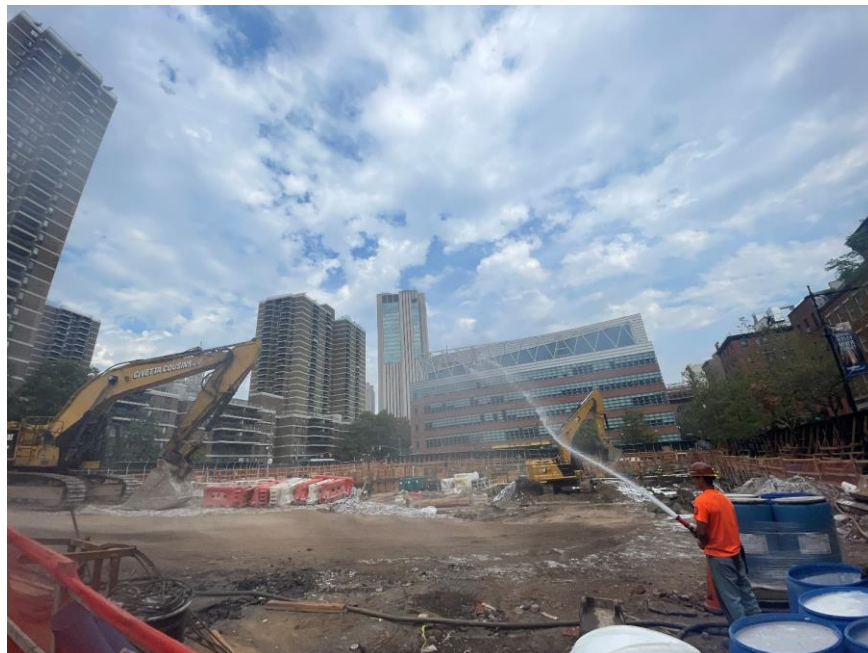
CCJV applying water to the ground surface for dust suppression in the central part of the site (facing northwest)
